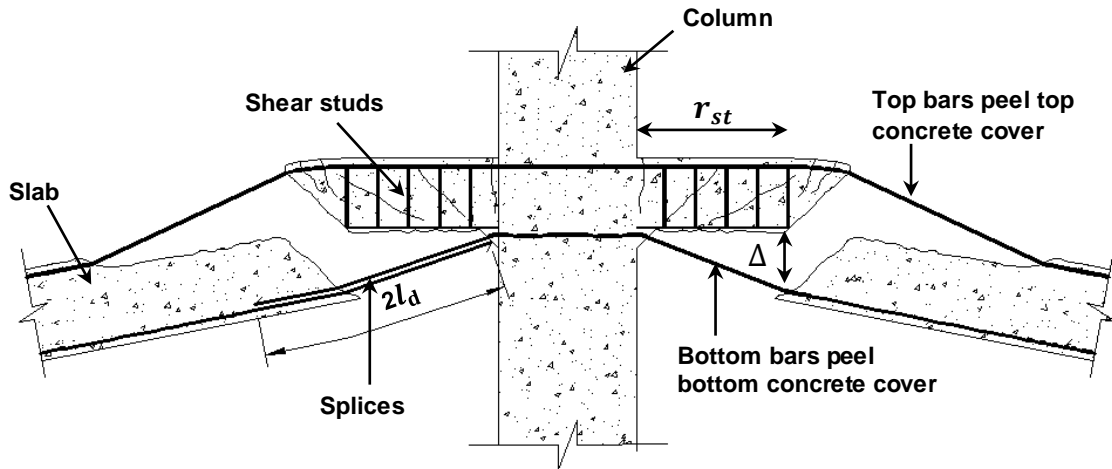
A possible punching failure of slab-column connections reinforced with shear studs
